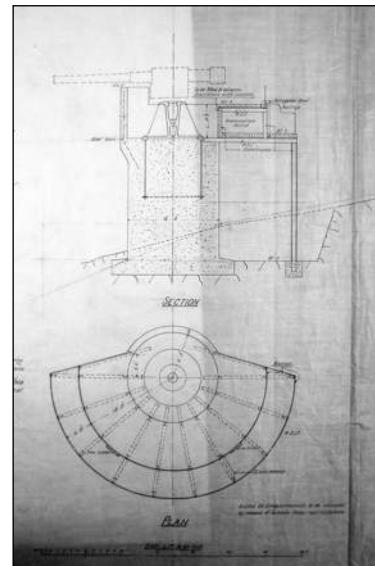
Plan and cross section of the 'temporary' gun mountings at Hound Point in about 1915. The mounting is still standing. (TNA WO 78/5173)
